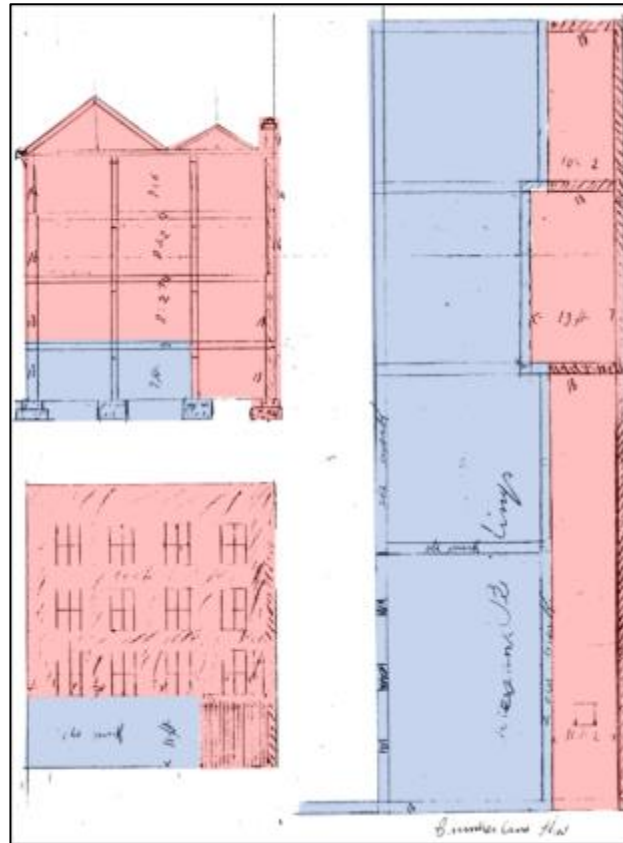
1901 plan showing the 1901 Phase one southern and upper extension (hashed lines and highlighted red) to the granary/malt floor and kiln buildings on Cumberland Street (DCC Archives). The 1868 building is highlighted blue. The profile view shows the Cumberland Street façade.
